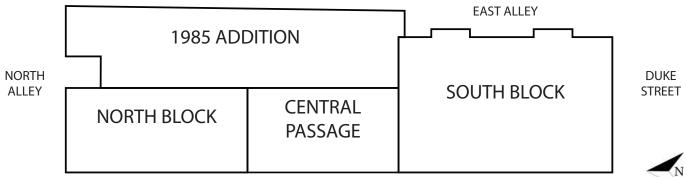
B-1: Key Plan of Freedom House, including South Block, North Block, Central Passage, and 1985 Addition.
